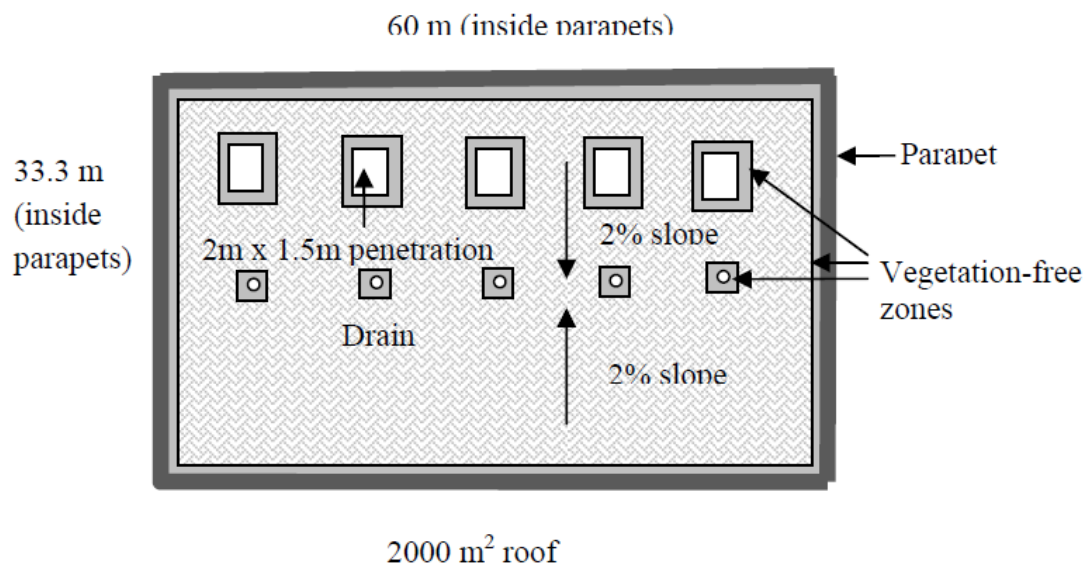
Plan view of green roof design (adopted from Seters et al., 2013).
